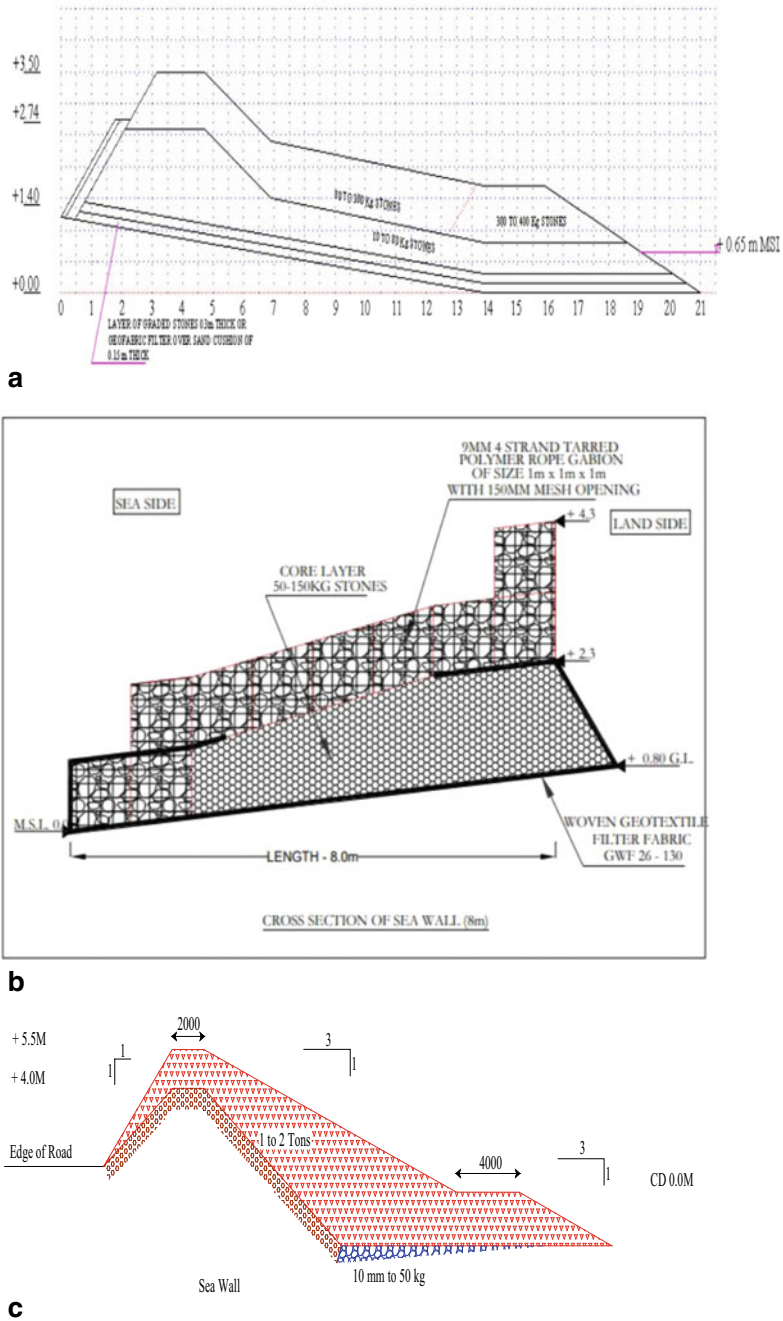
a Seawall cross section at Shankumukam (Proposal 1). b Seawall cross section at Shankumukam (Proposal 2). c Seawall cross section at North of Chennai harbour [18]
